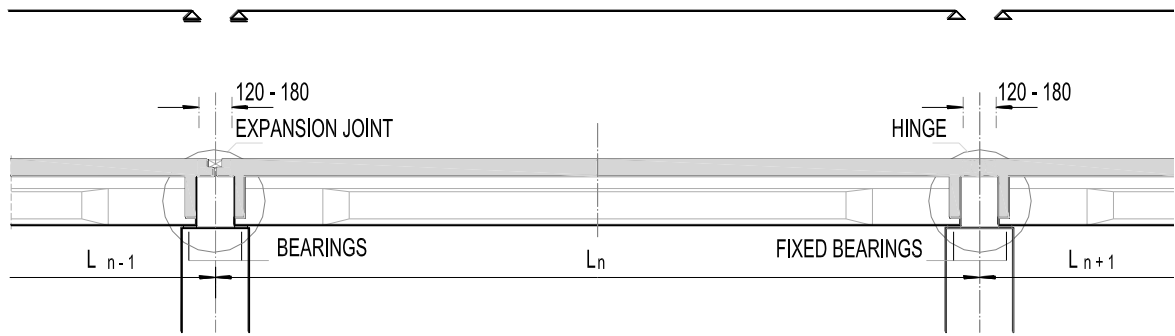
Typical discontinuity of pre-stressed reinforced concrete bridges made of pre-fabricated girders
